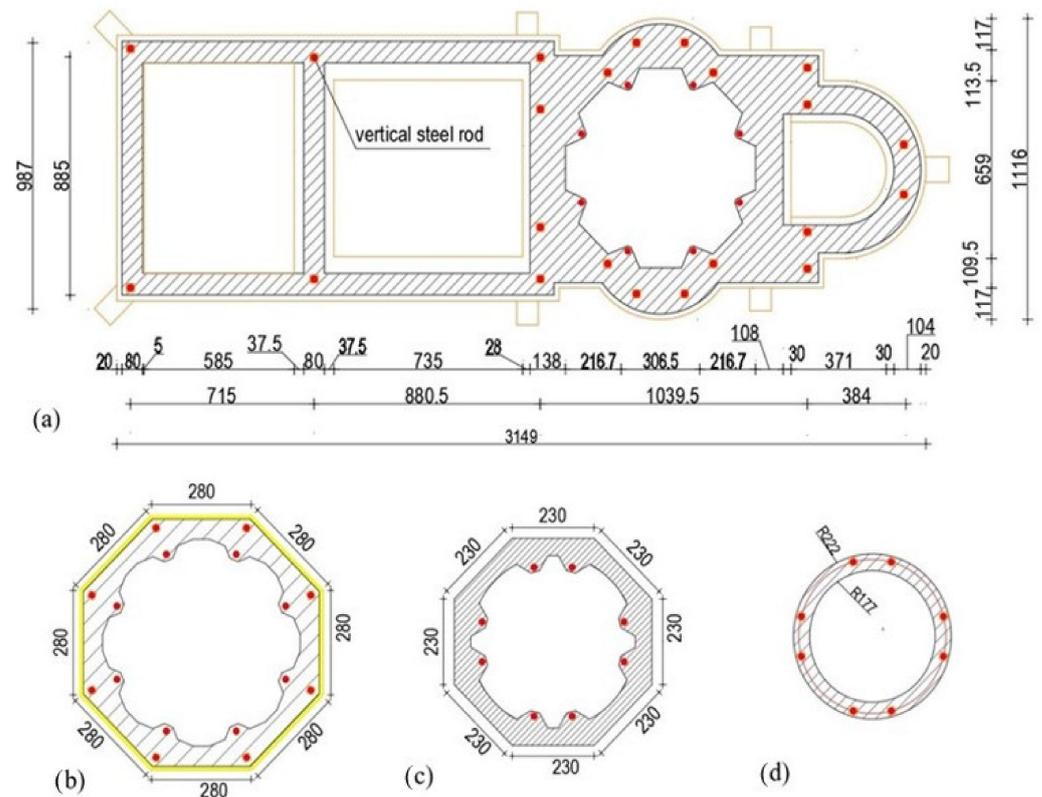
Reinforced concrete girders (dimensions in cm): (a) Attic level; (b,c) Lower levels of the tower, (d) Upper level of the tower (dimensions in cm).
